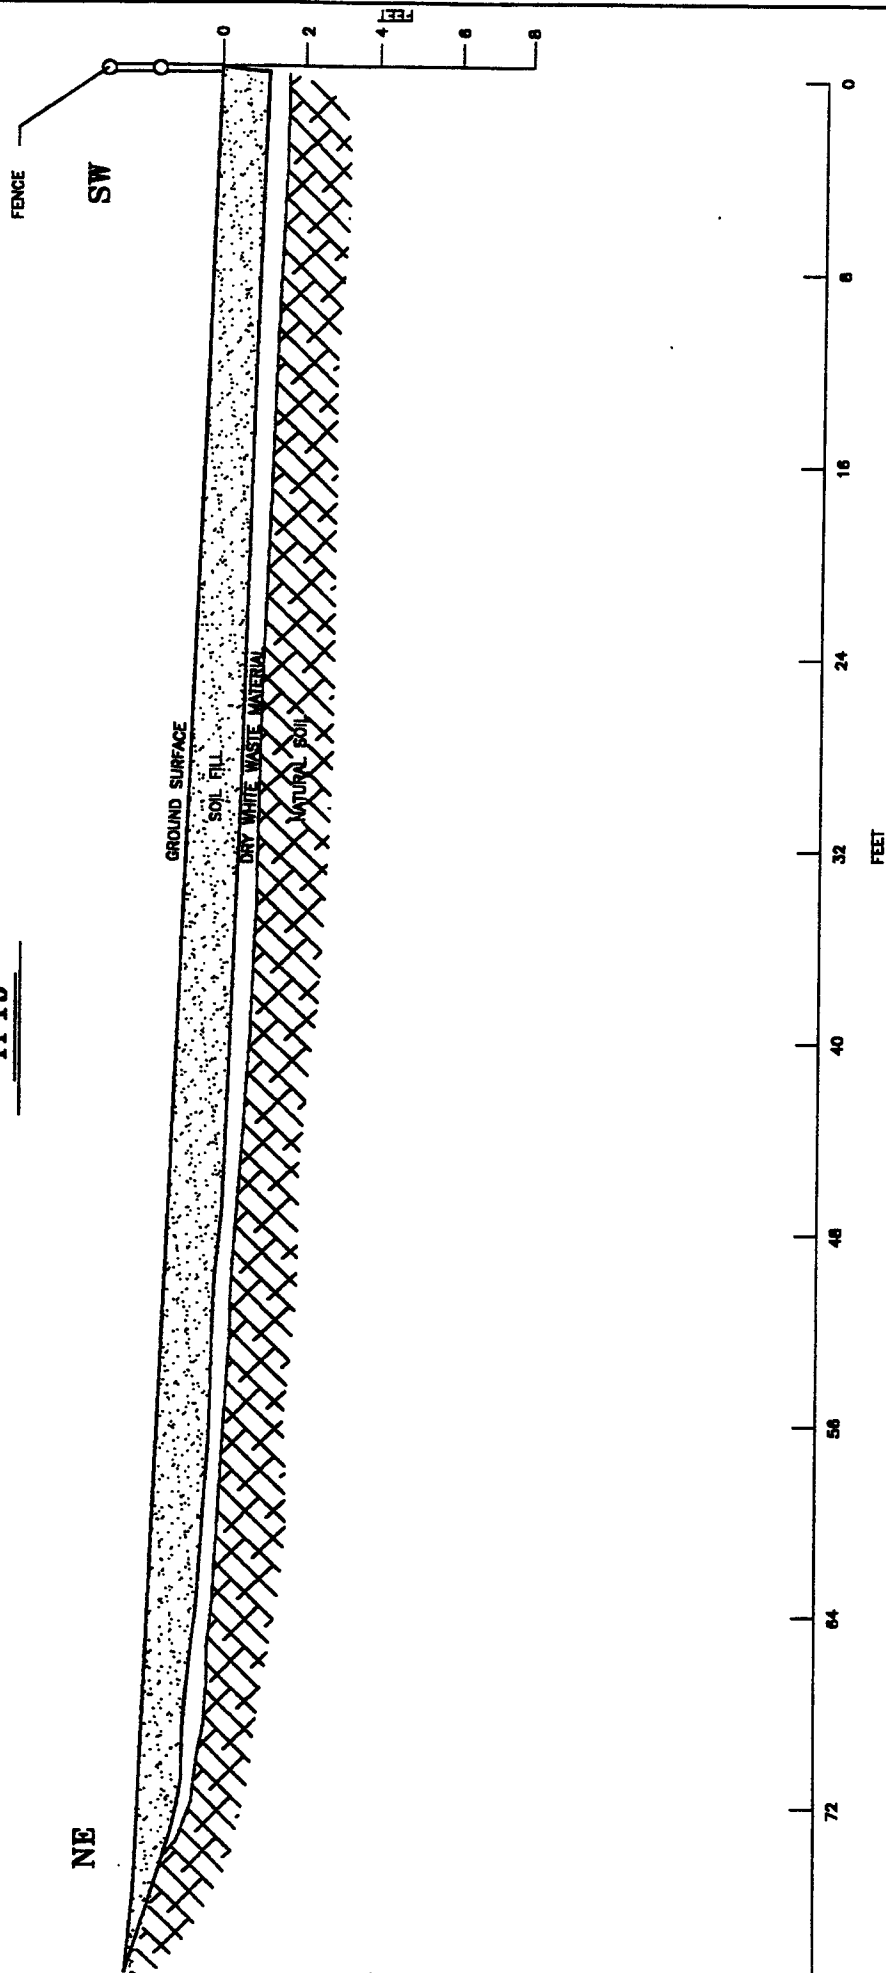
FIGURE:			LANDFILL INVESTIGATION TEST PIT CROSS SECTION TEST PIT 18 LAURENS CERAMICS SITE LAURENS, SOUTH CAROLINA
